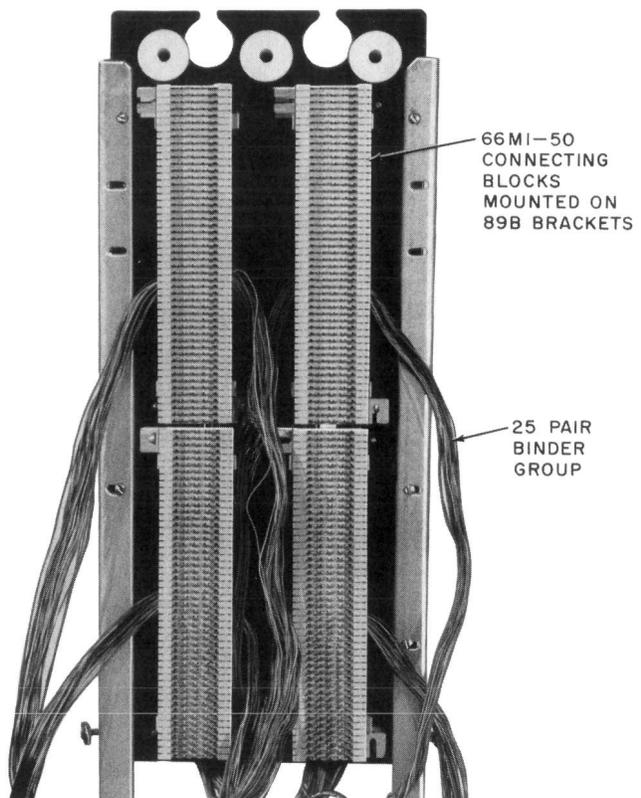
66M1-50 Connecting Blocks Placed on 89B Brackets (LG-10/43)
